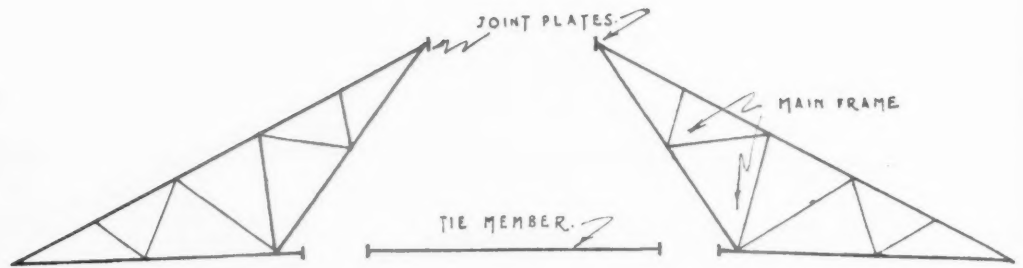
Composite roof truss for spans ranging from 15' to 40'.
